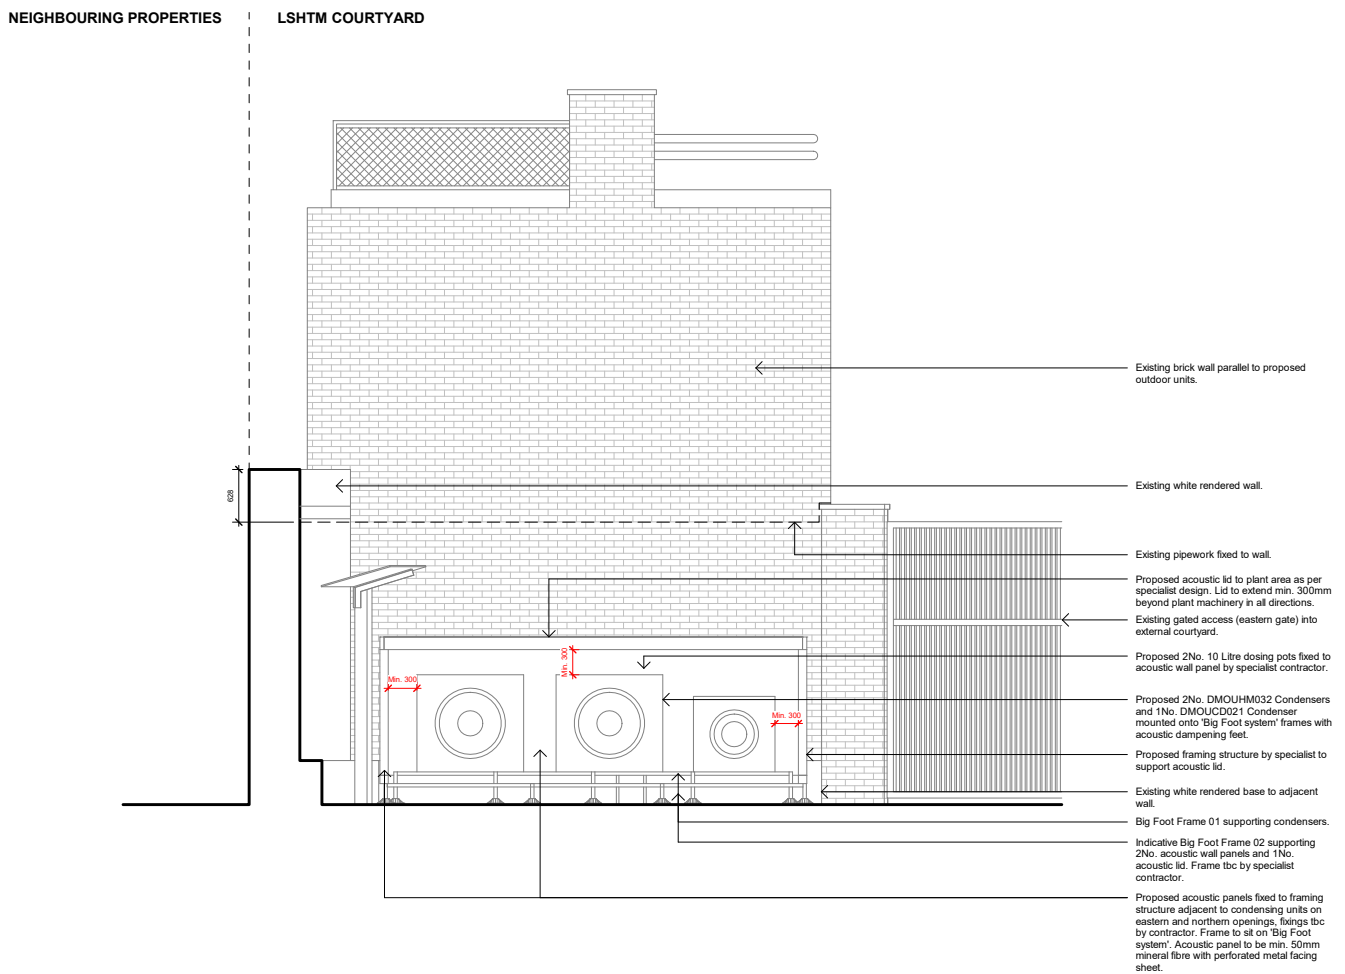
Elevation (not to scale) looking east and the perimeter wall, the condensers neatly stacked ahead of it.
